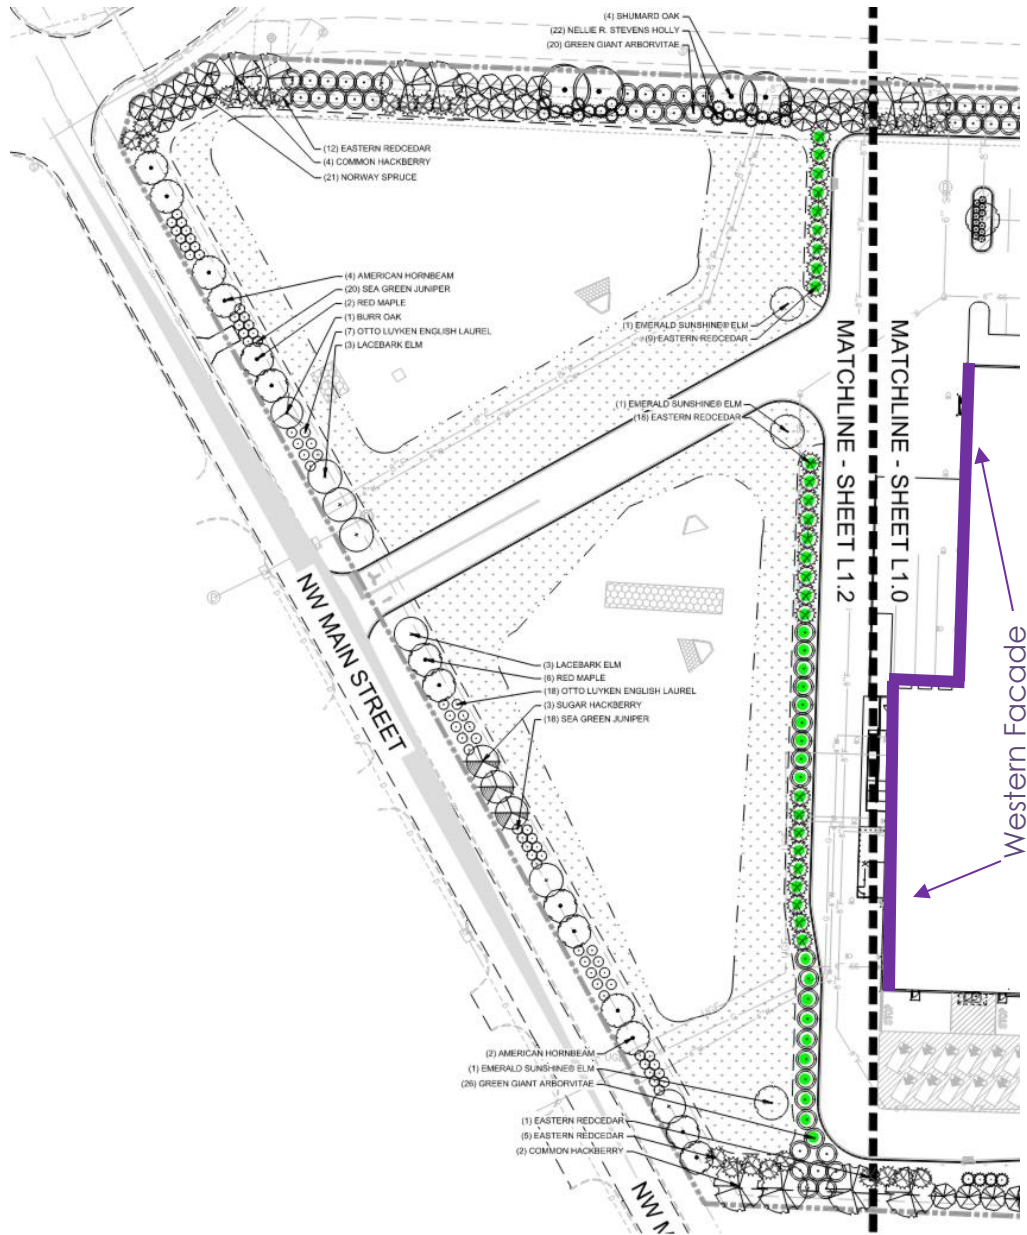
Proposed Landscape Plan Illustrating the Location of the Proposed Additional Screening Trees (Highlighted in Green and Western Façade in Purple)
